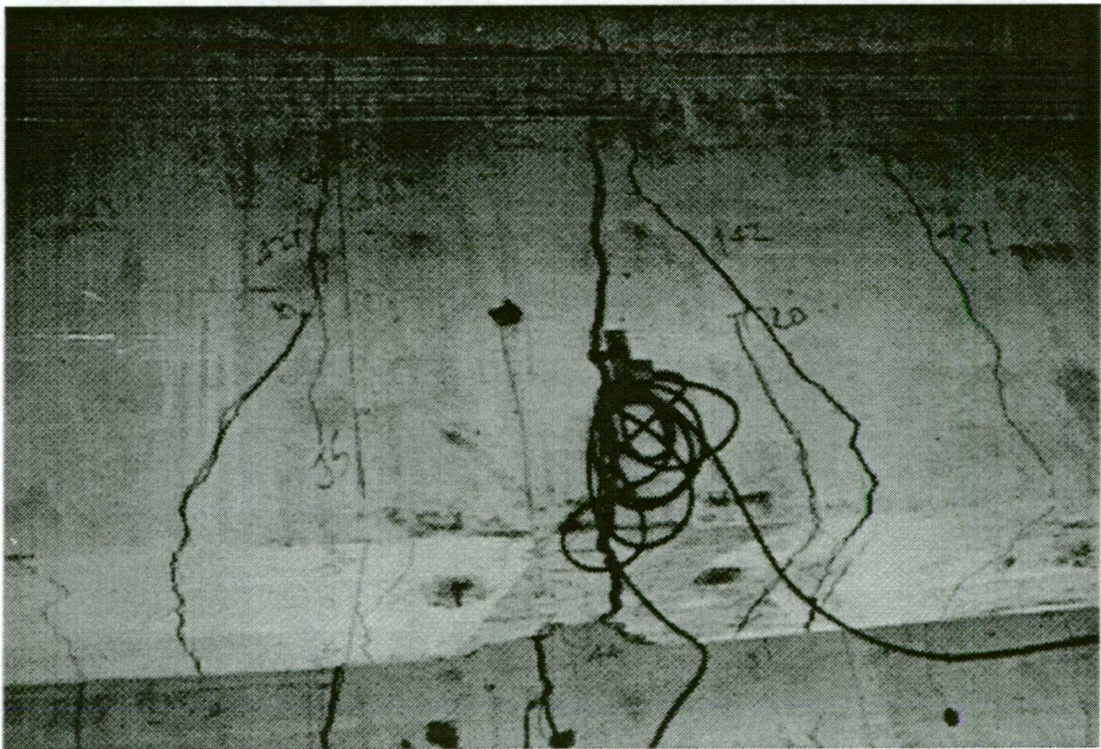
Cracking of Fifth Beam at Ultimate Load
